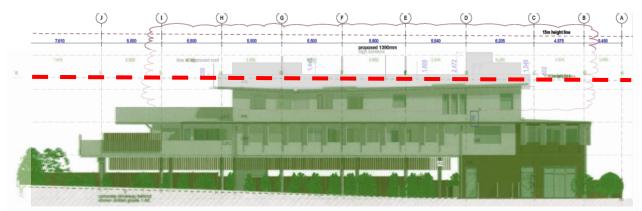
Indicative overlay of the proposed rooftop with the approved roof form (green) and maximum building height plane (red)
